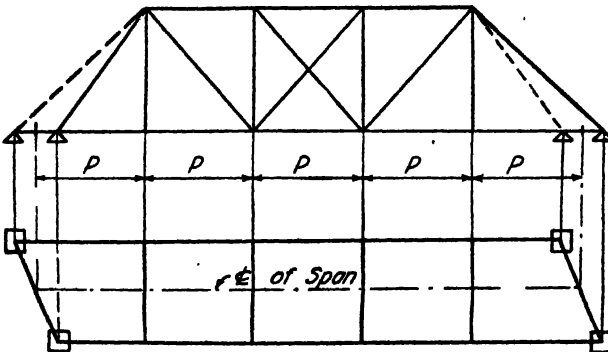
l. Arrangement of Trusses for a Skew Span in which the Skew is Too Short for an Economical Panel Length.
